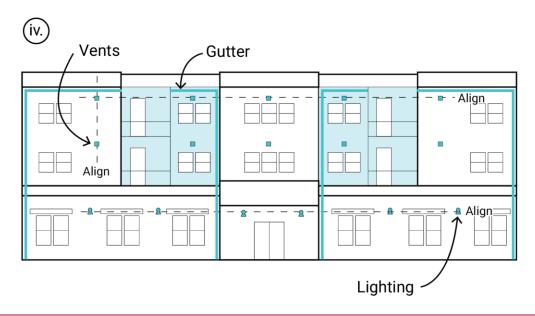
(B)(5)(a)(iv): Building equipment alignment
